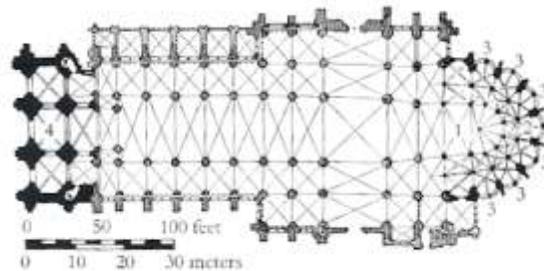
Plan of Abbey Church of St. Denis 1140 AD.
